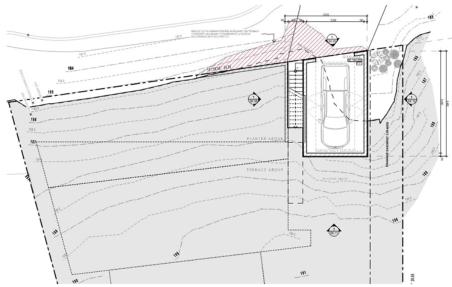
Ground floor garage and excavation of site and road reserve (Crump Architecture, 2022)
